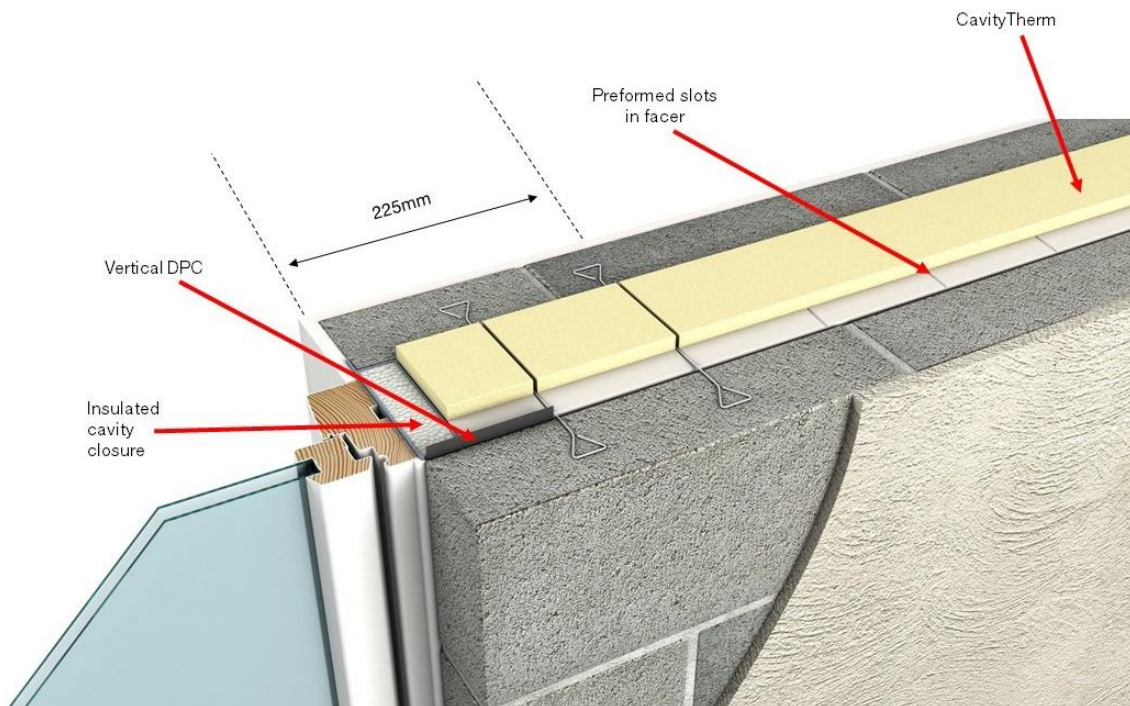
Installation of Additional Wall Ties Windows/Door Openings.
